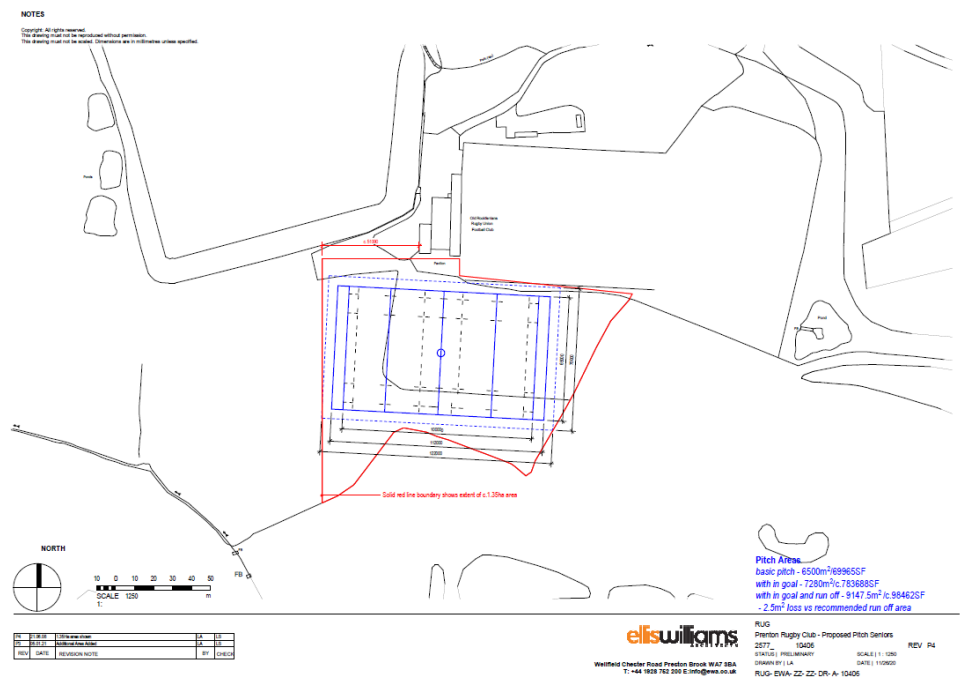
Prenton Rugby Club – Proposed Pitch Seniors plan (ref: RUG- EWA- ZZ- ZZ- DR- A- 10404 Rev P4) [Plan 13 of the Appellant’s Statement of Case]
